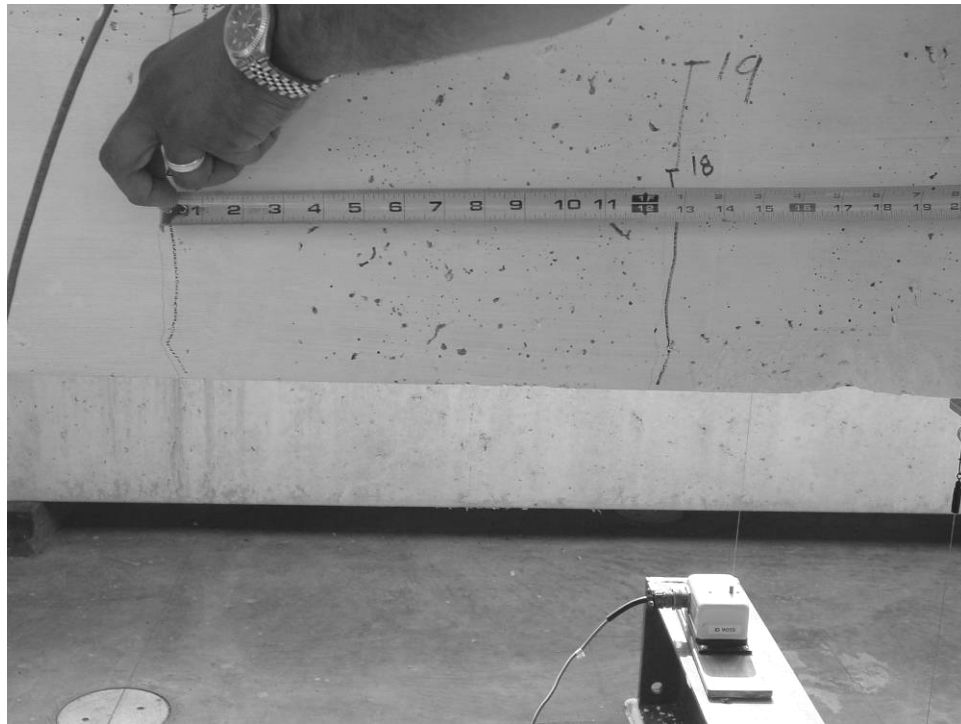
Typical flexural cracking at midspan of C-Channel girders before yielding of lower prestressing strands
